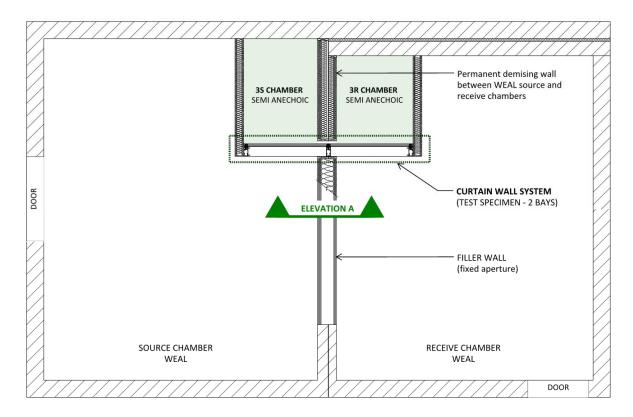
Plan drawing of weal test chambers and phase 3 test rig 3s/3r chambers
